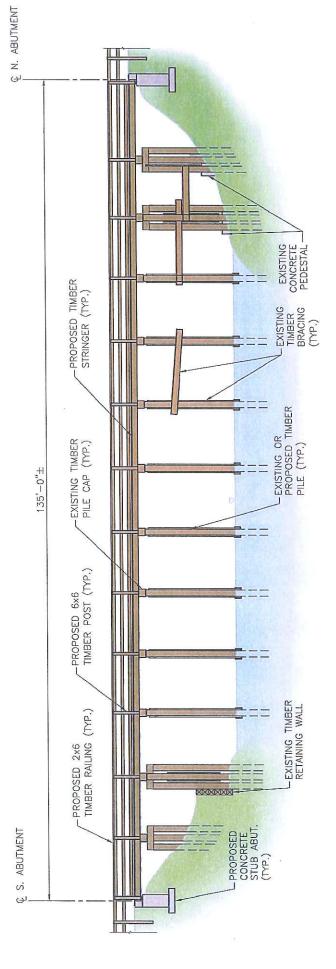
Alternative 1 – Rehabilitation of Existing Bridge Structure Elevation View
